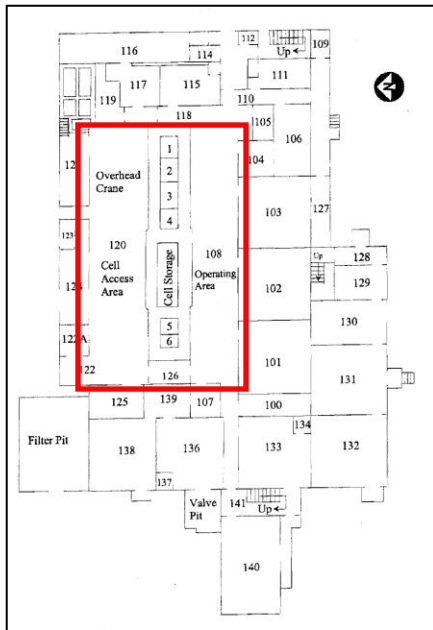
A. Plan View of Floor 1 of Building 2026 (ORNL, 2007)
